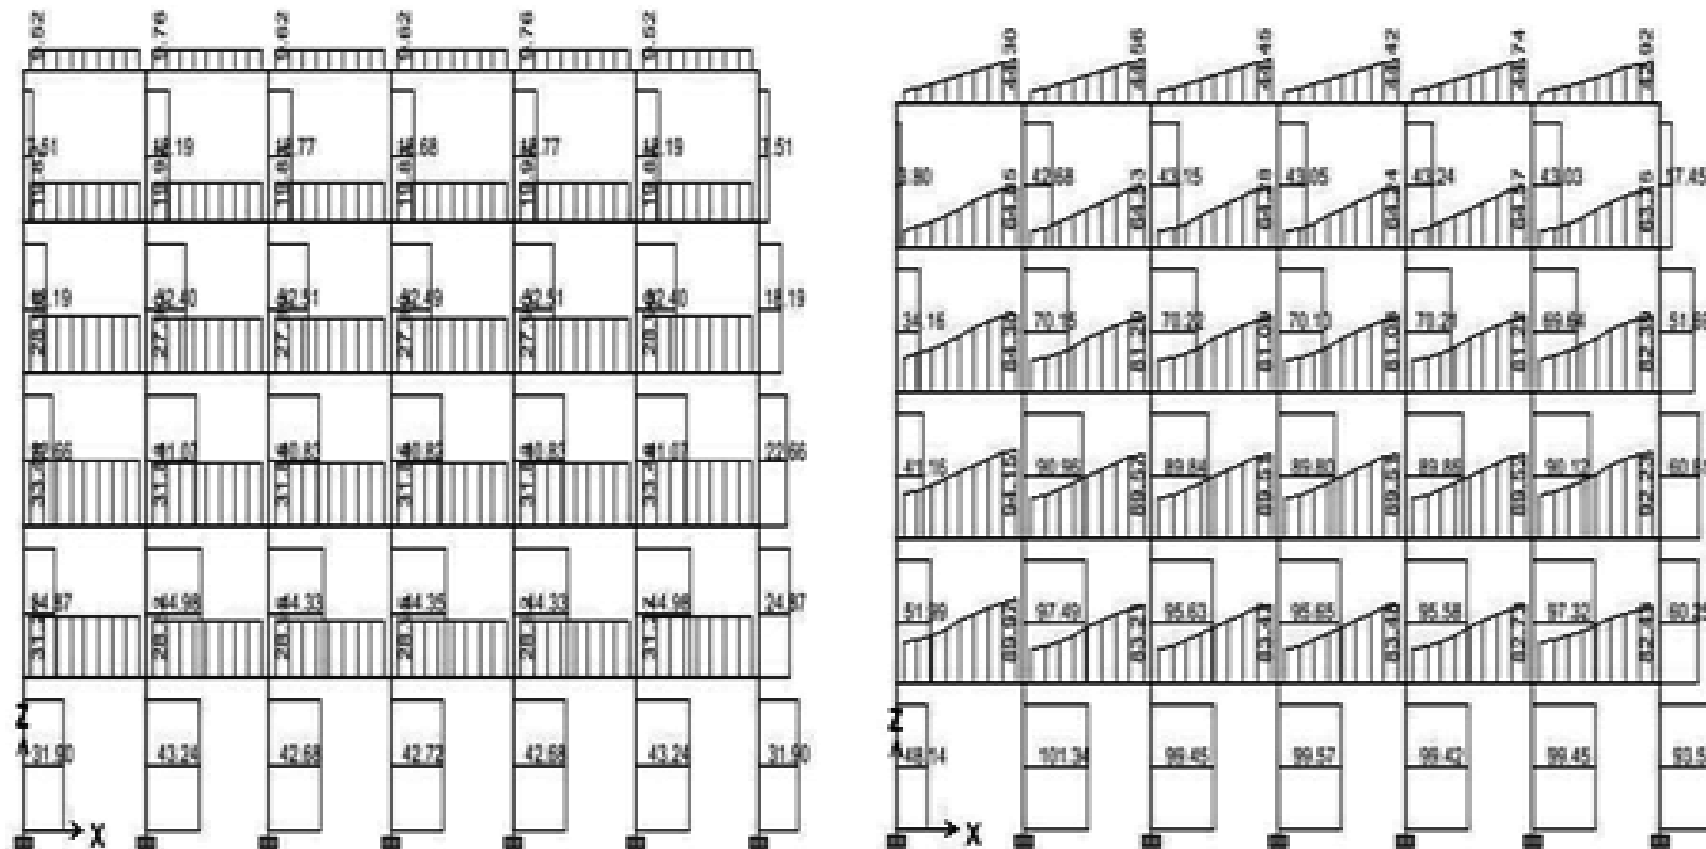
SHEAR FORCE FOR THE 5 STOREY R/C FRAME BUILDING
